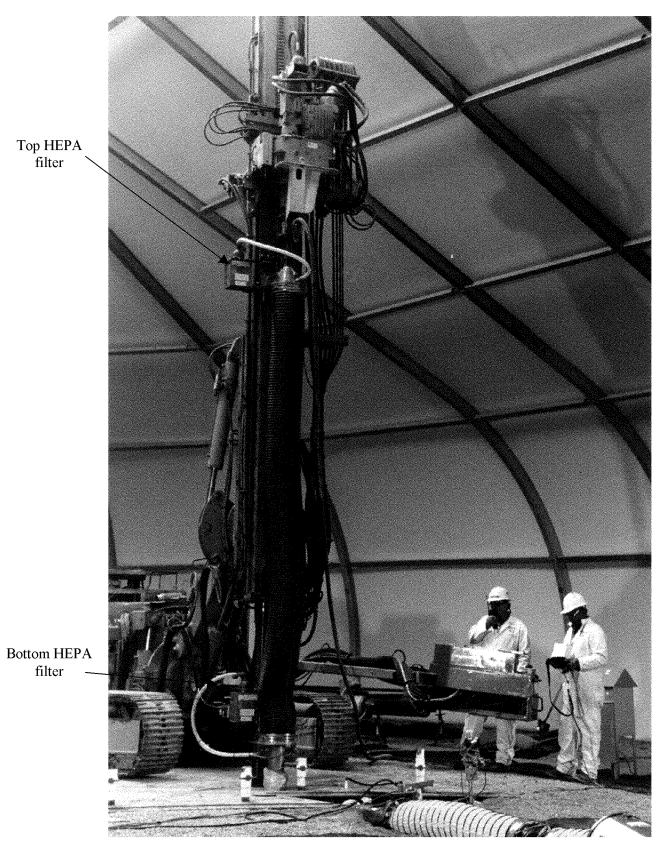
Drill string being inserted into waste pit (Photo PN01-520-4-22).
